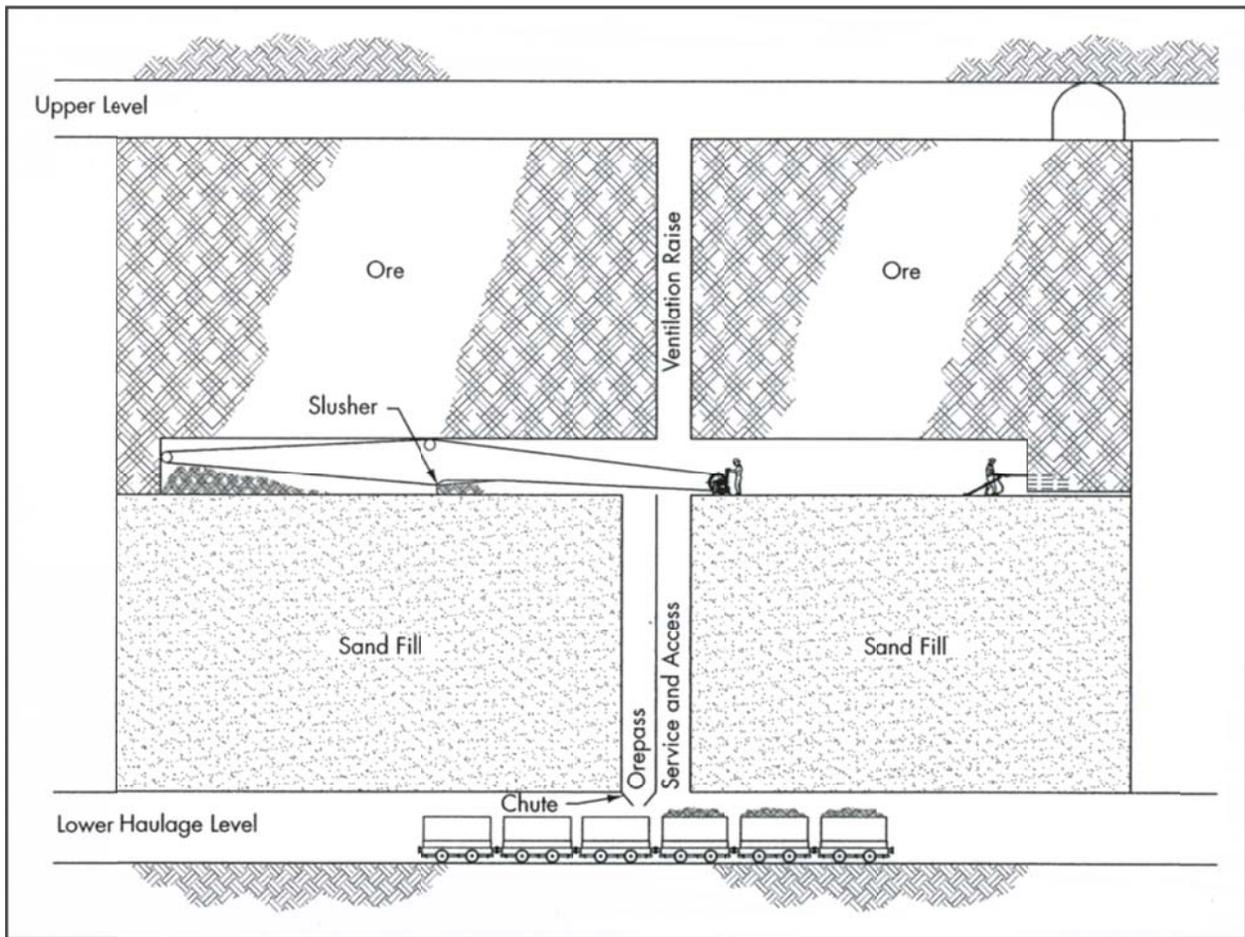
Typical Historic Overhand Cut and Fill Stope – Longsection View
